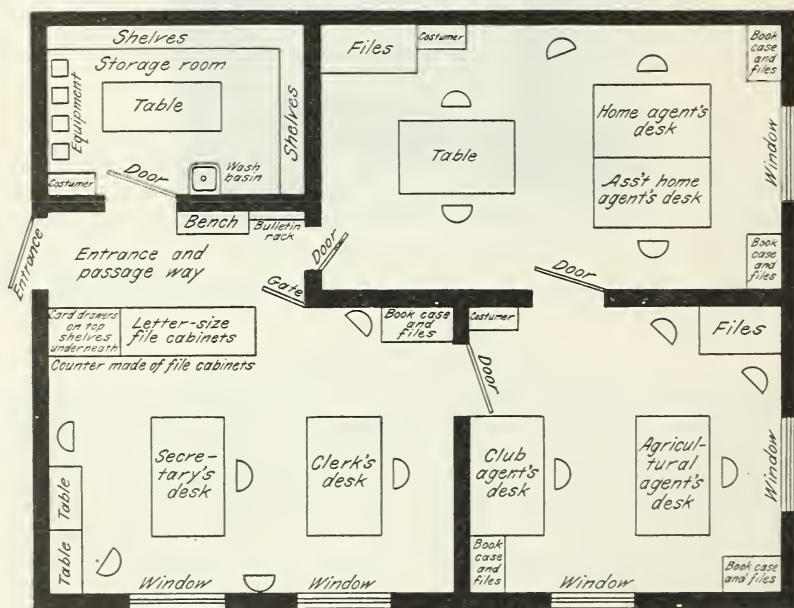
Floor plan of a well-arranged county extension office. Outside dimensions, 25 by 32 feet.
